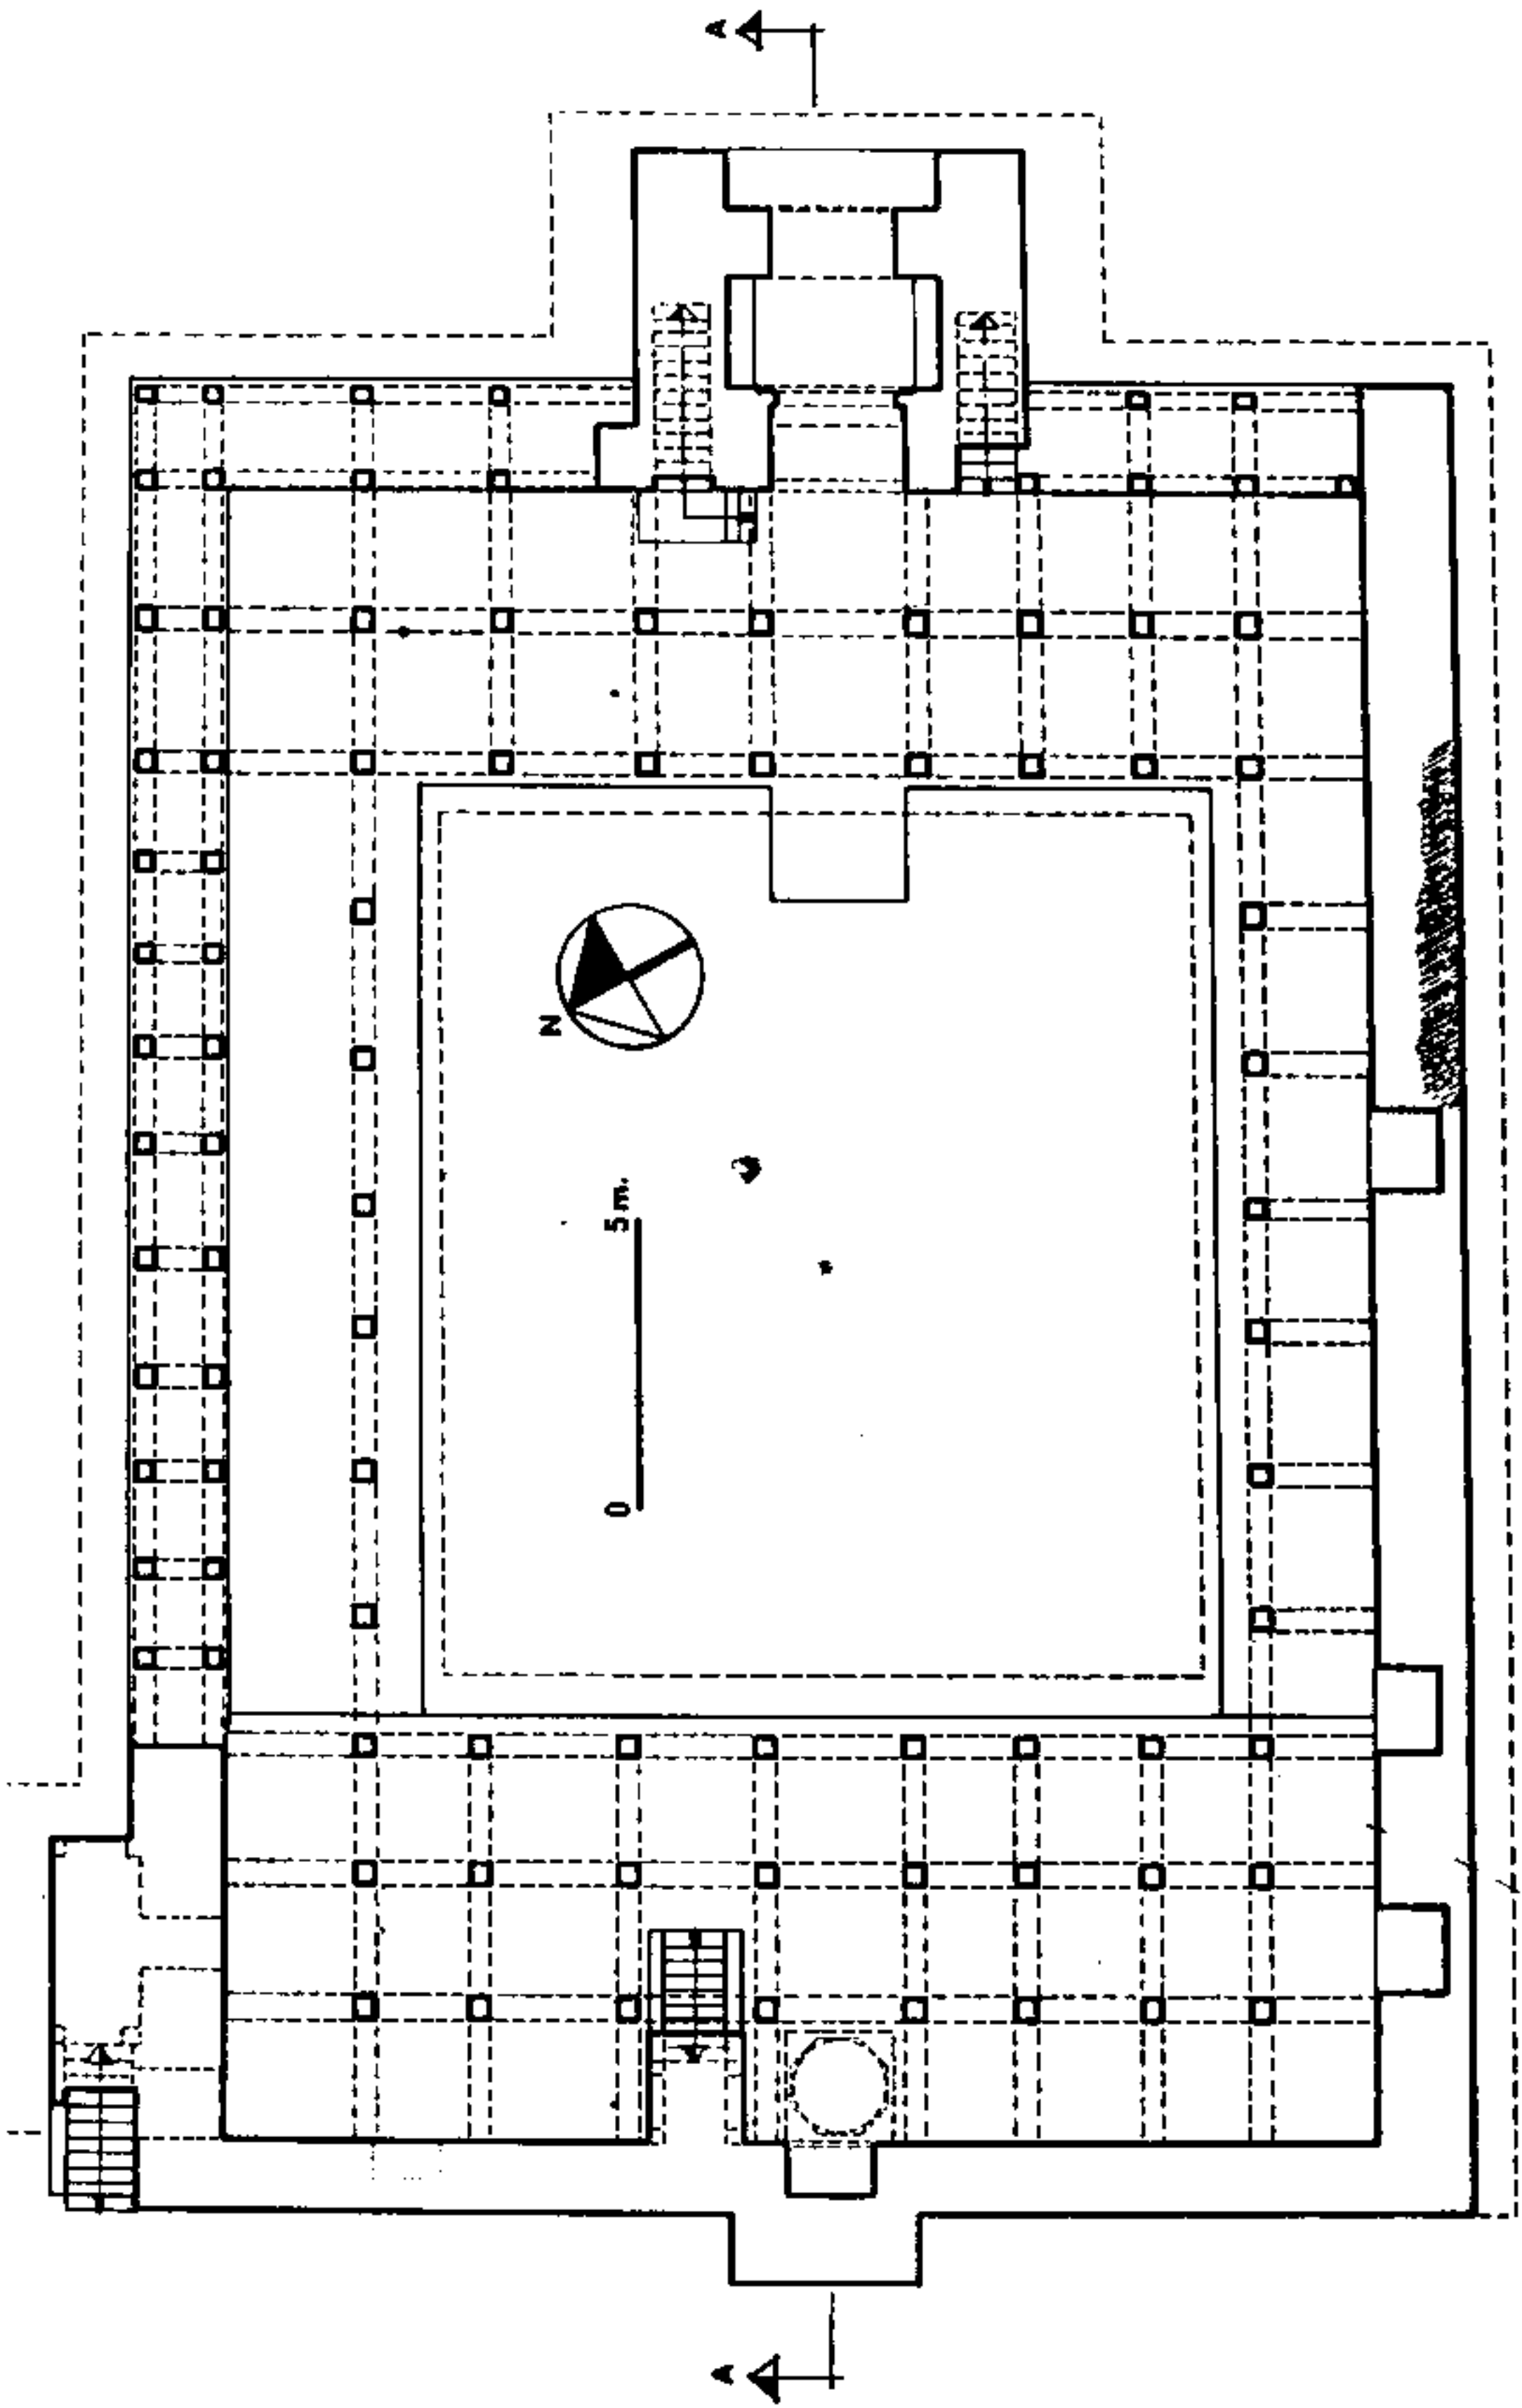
Kaman, Chaurasi Khamba Masjid, ground plan.
